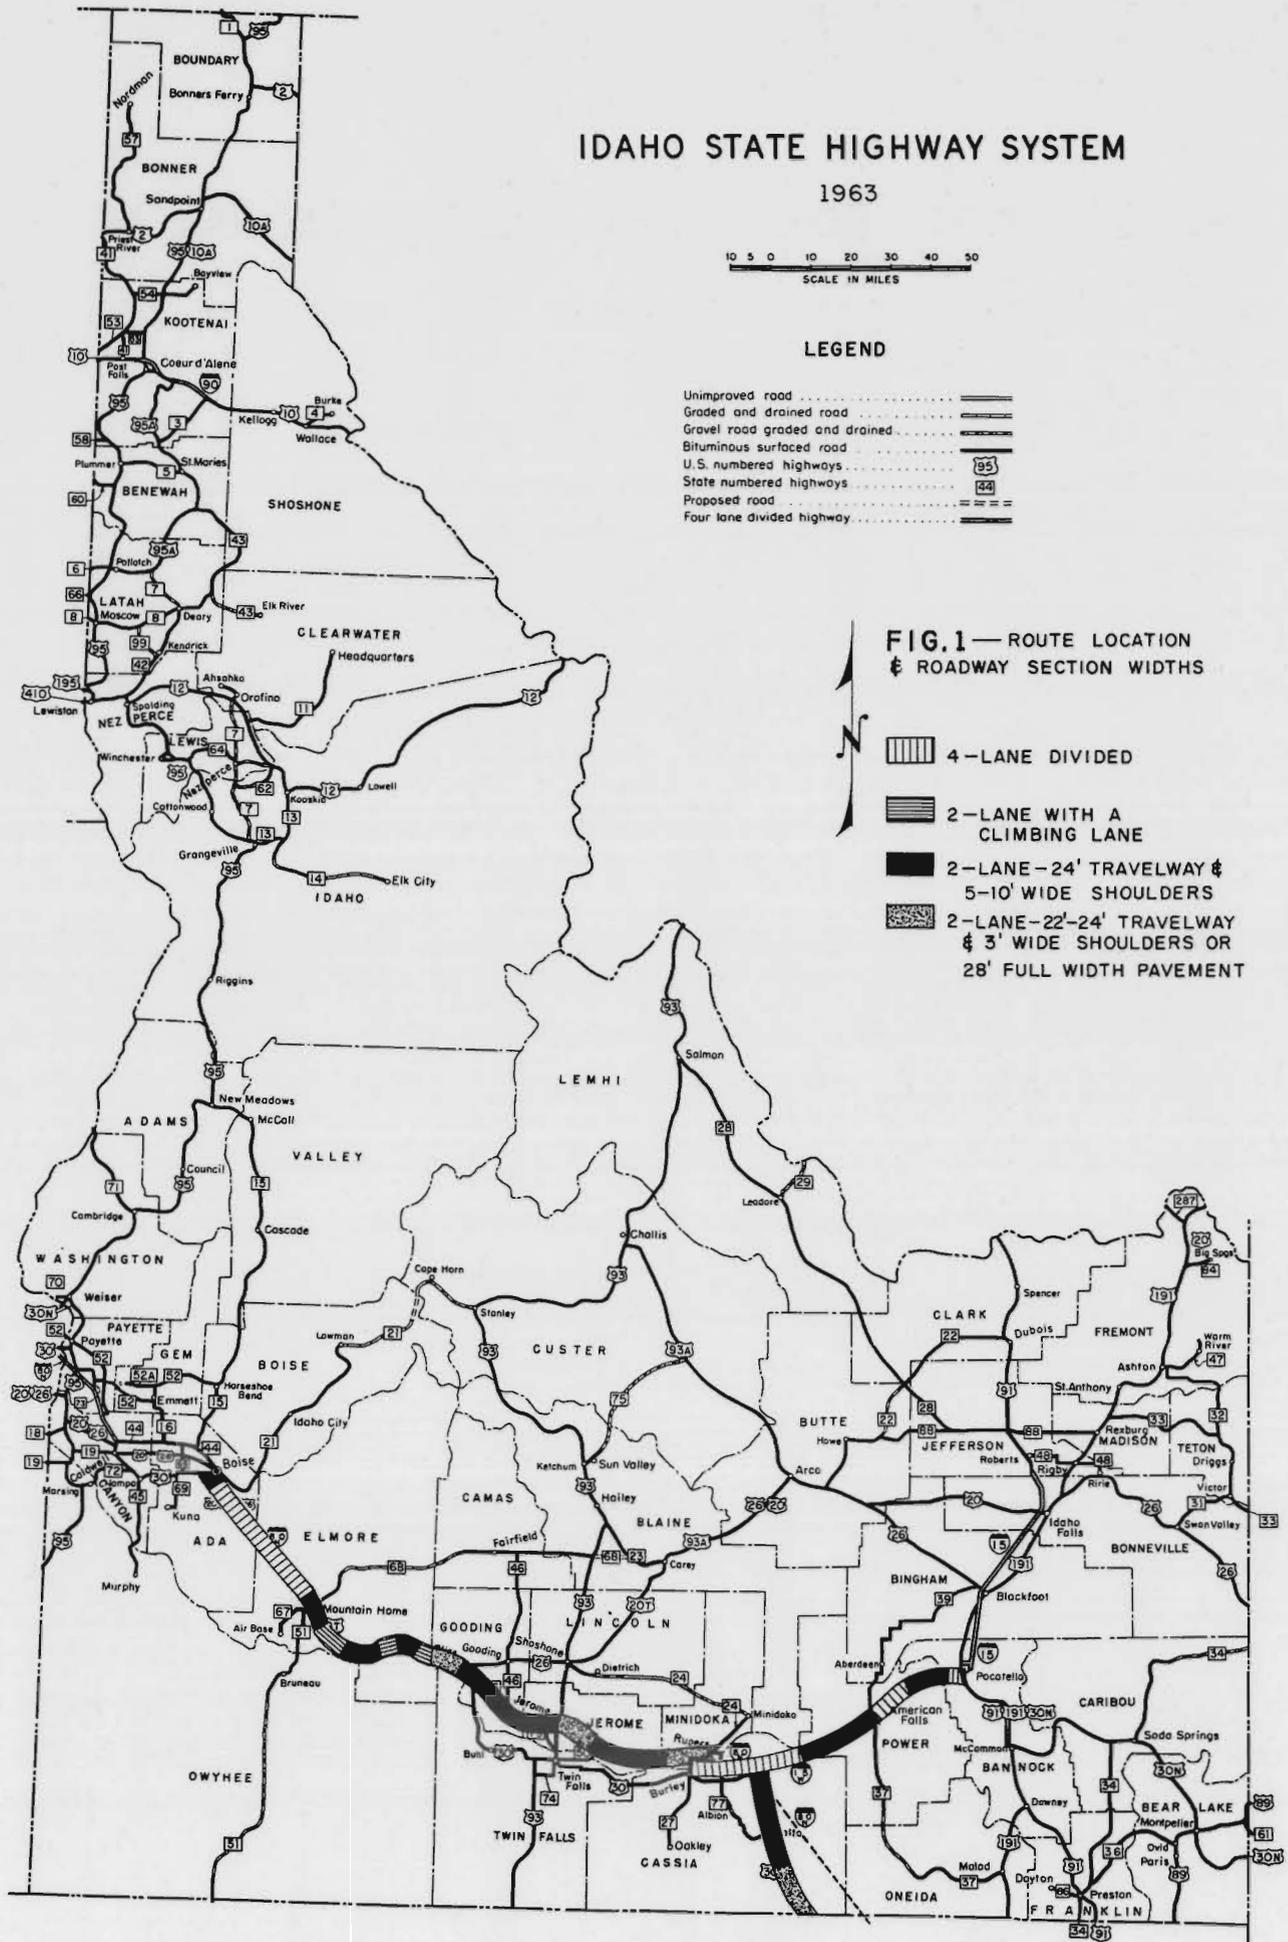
ROUTE LOCATION & ROADWAY SECTION WIDTHS
